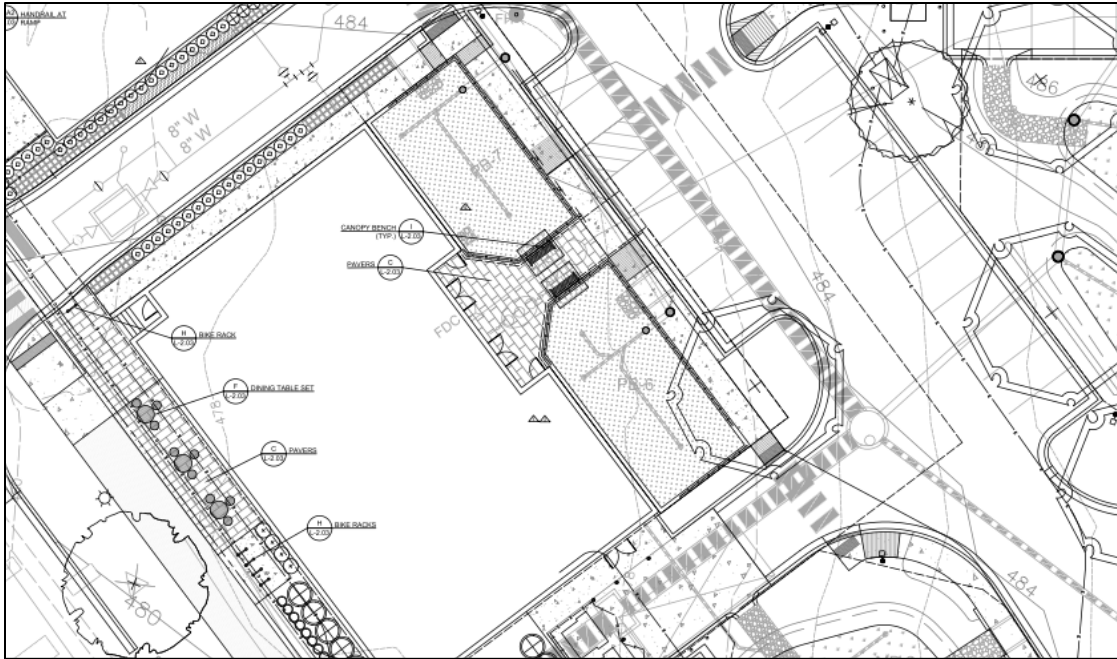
Proposed Landscape Around Building C and Along the Water Avenue drive-aisle
